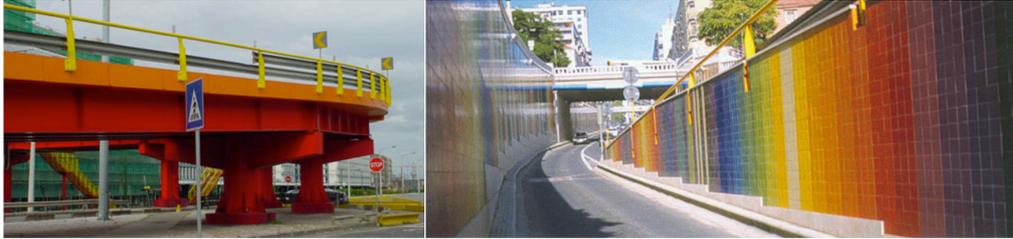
Structure and detail from Eduardo Nery tiles' viaduct mural
